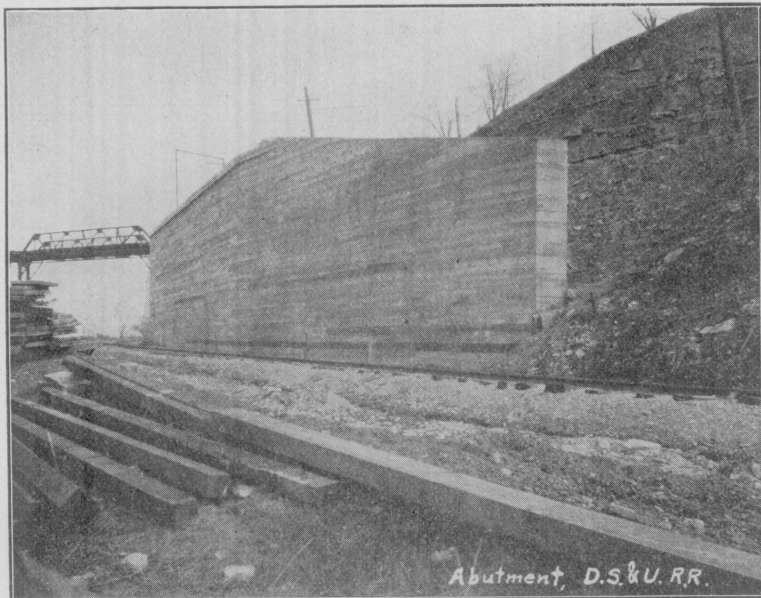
Concrete Abutment on the D., S. & U. R. R., Near Dayton, Ohio.
